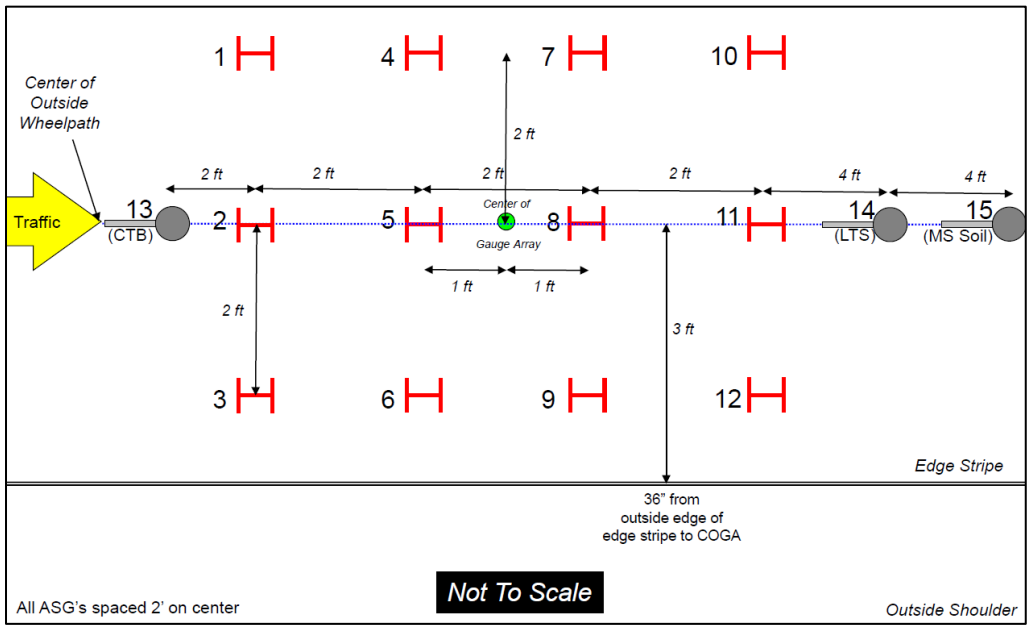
The Stabilized Foundation Section (S2) Gauge Arrangement.
